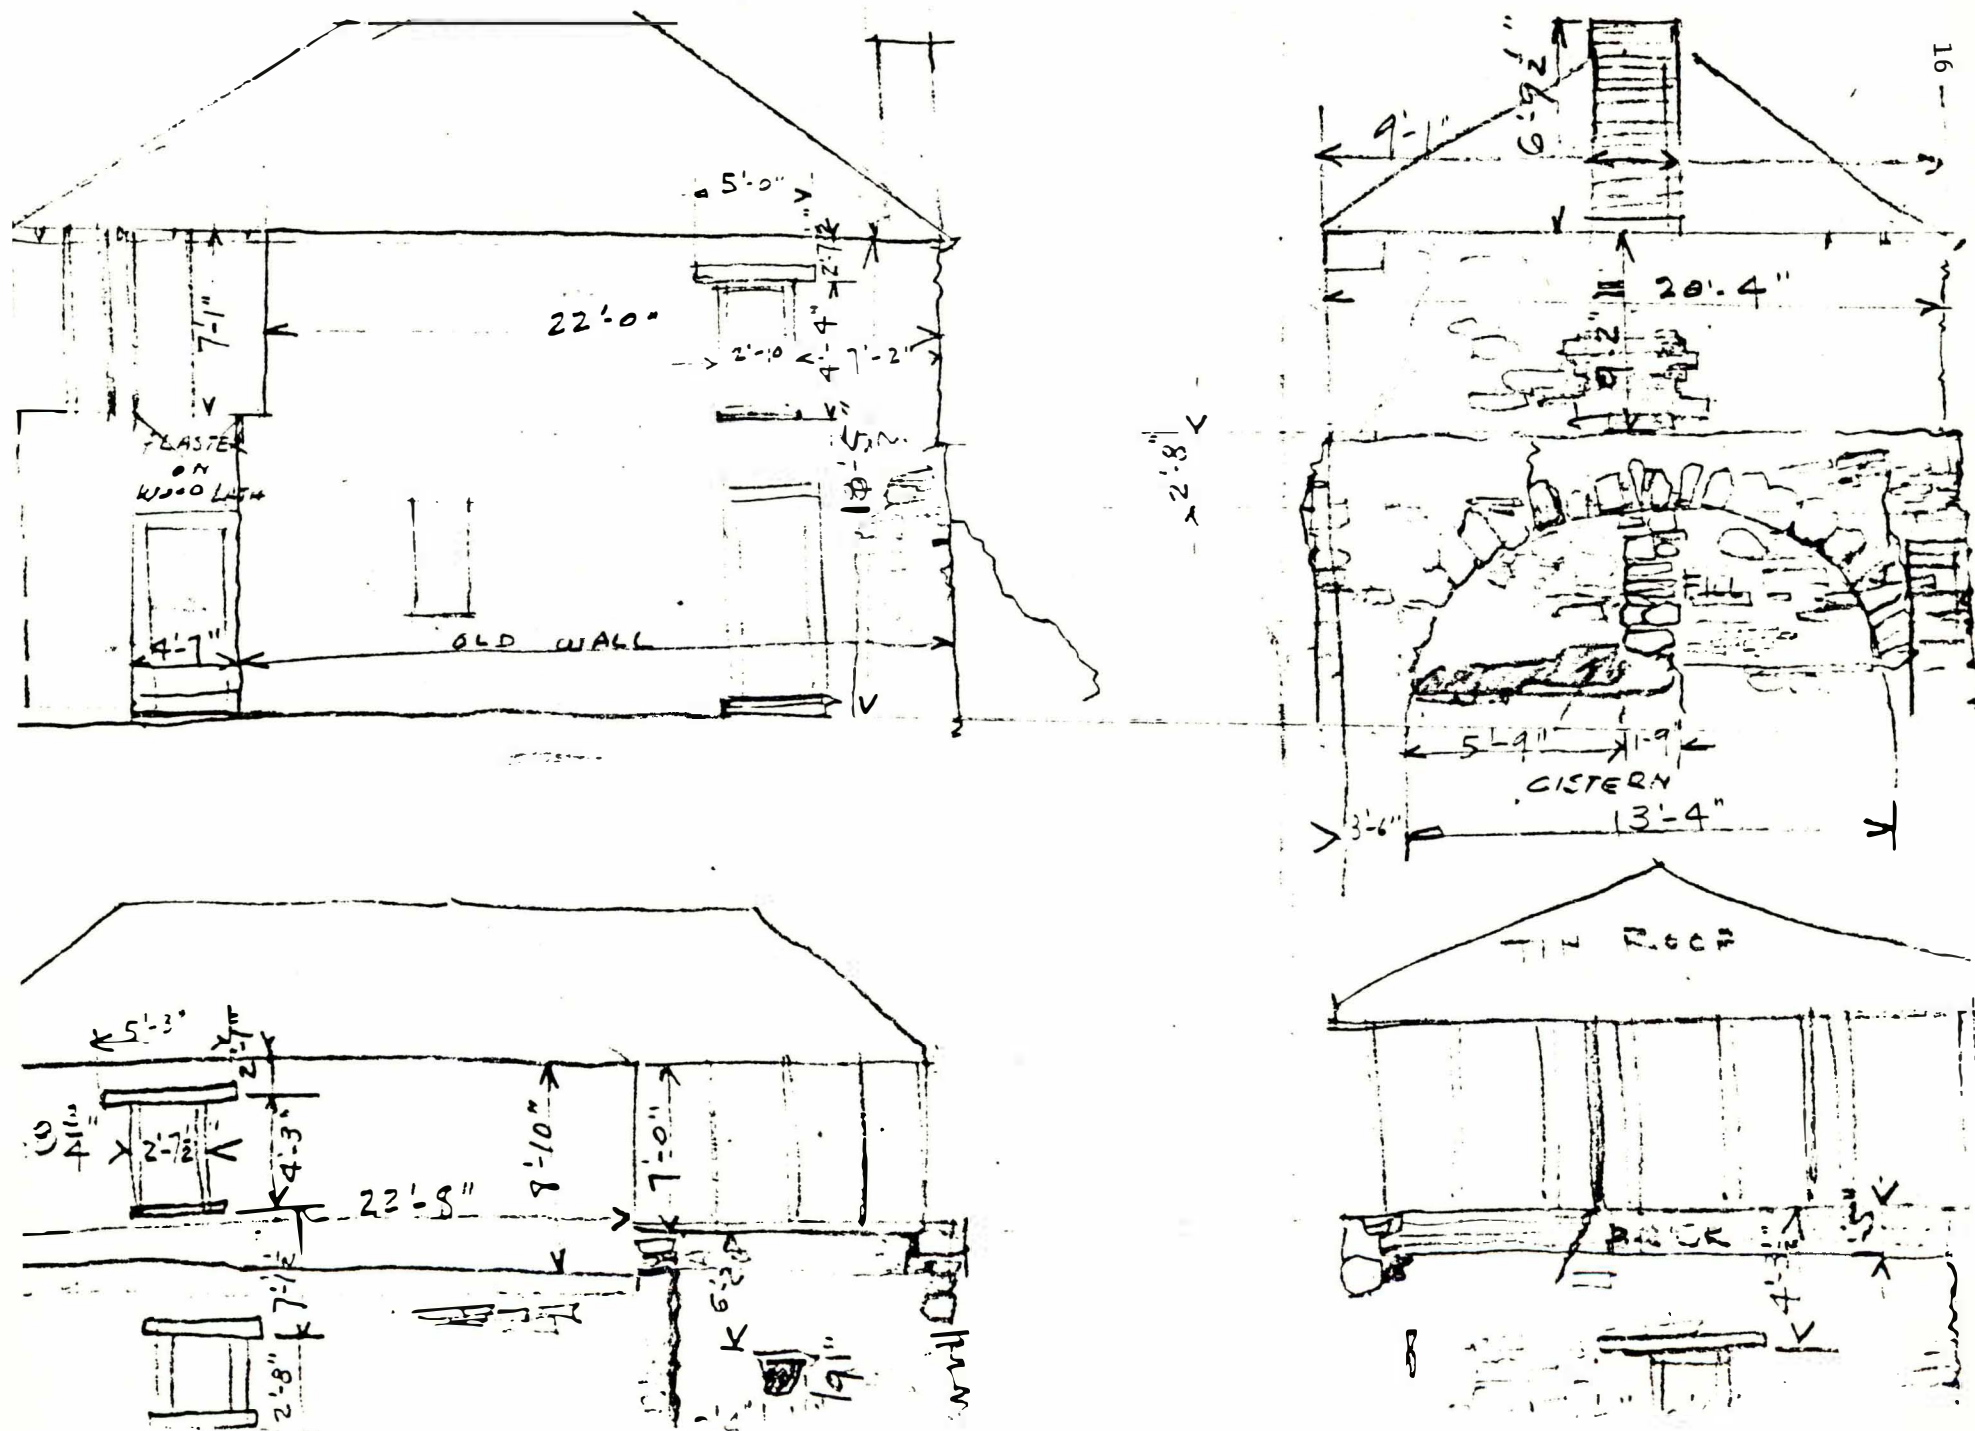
Nineteenth century construction, as of 1934, built over original walls and buildings.
